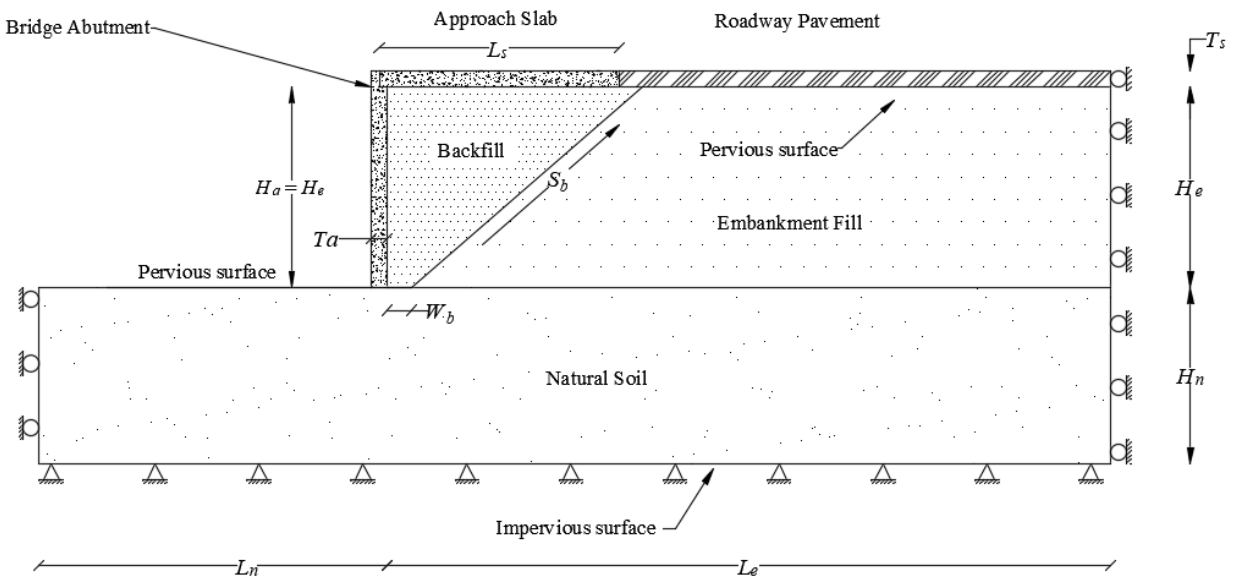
Layout of the two-dimensional longitudinal model with wall abutment
